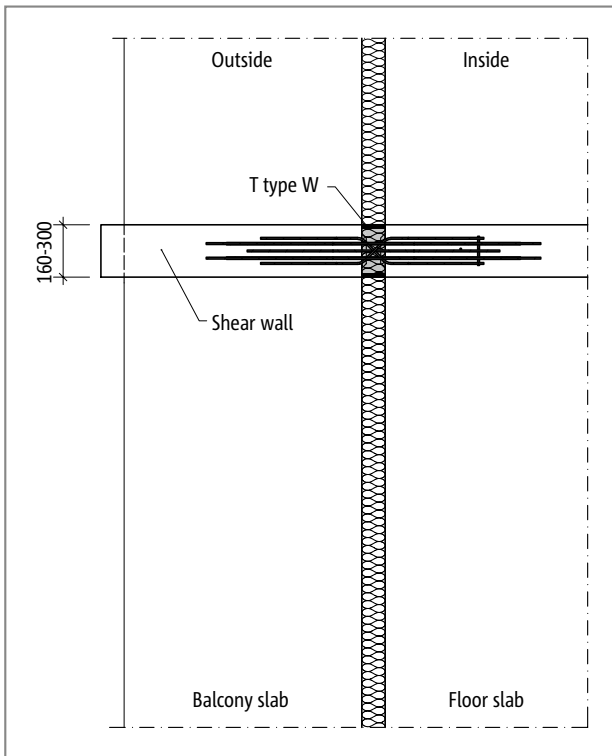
Schöck Isokorb® T type W: Layout; Balcony structure with thermally insulated load-bearing shear walls
